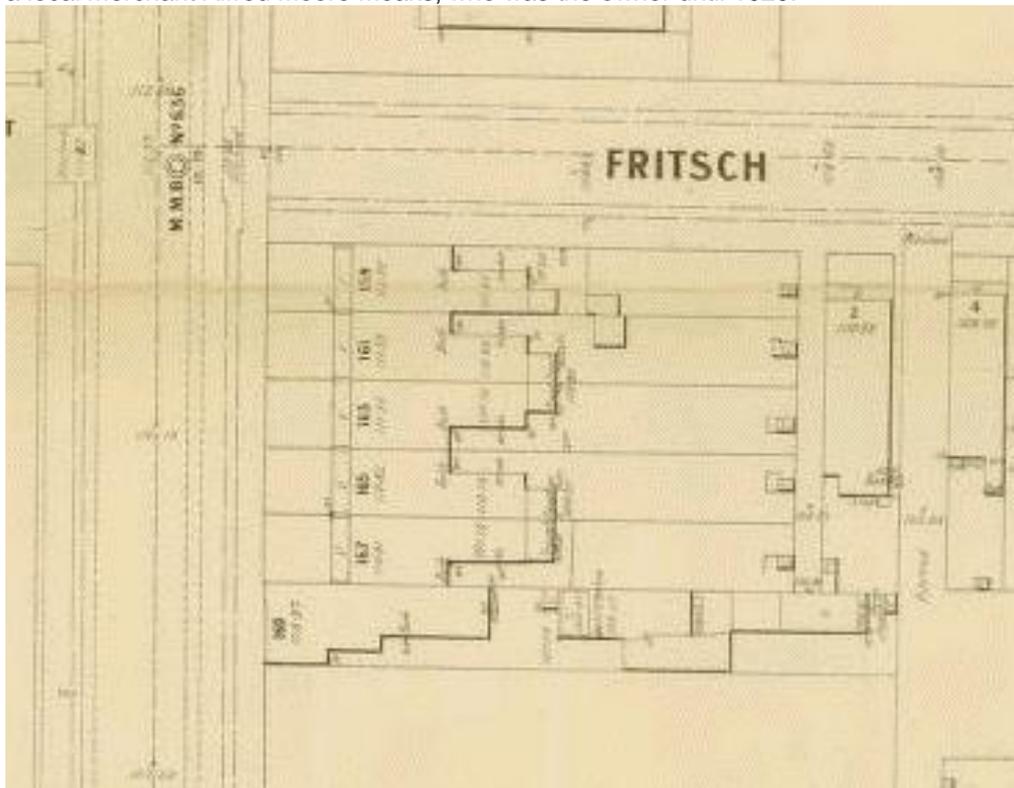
MMBW Detail Plan no. 1541 (dated 1903) shows the terrace, then numbered 159-167 Auburn Road. (source: SLV)
